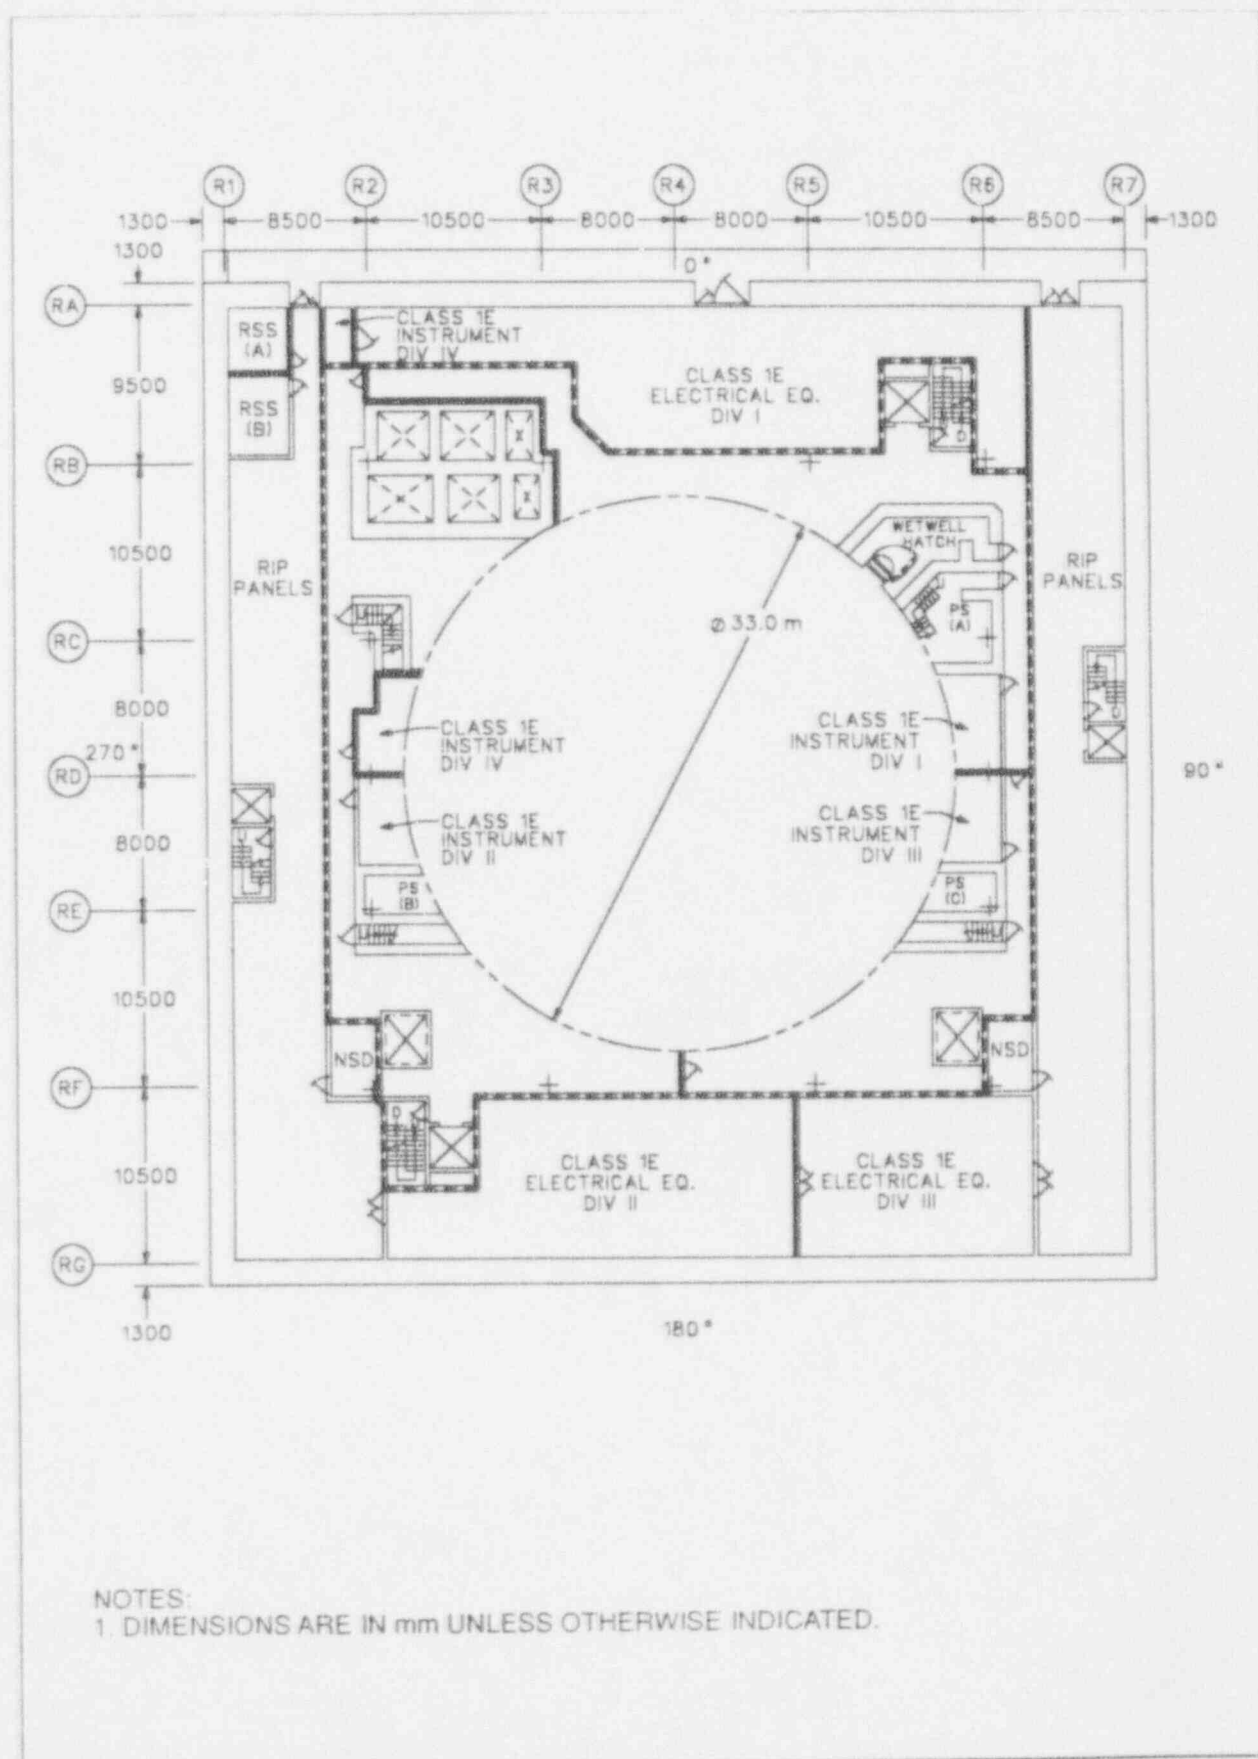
Reactor Building Arrangement Floor B1F—Elevation 4800 mm
